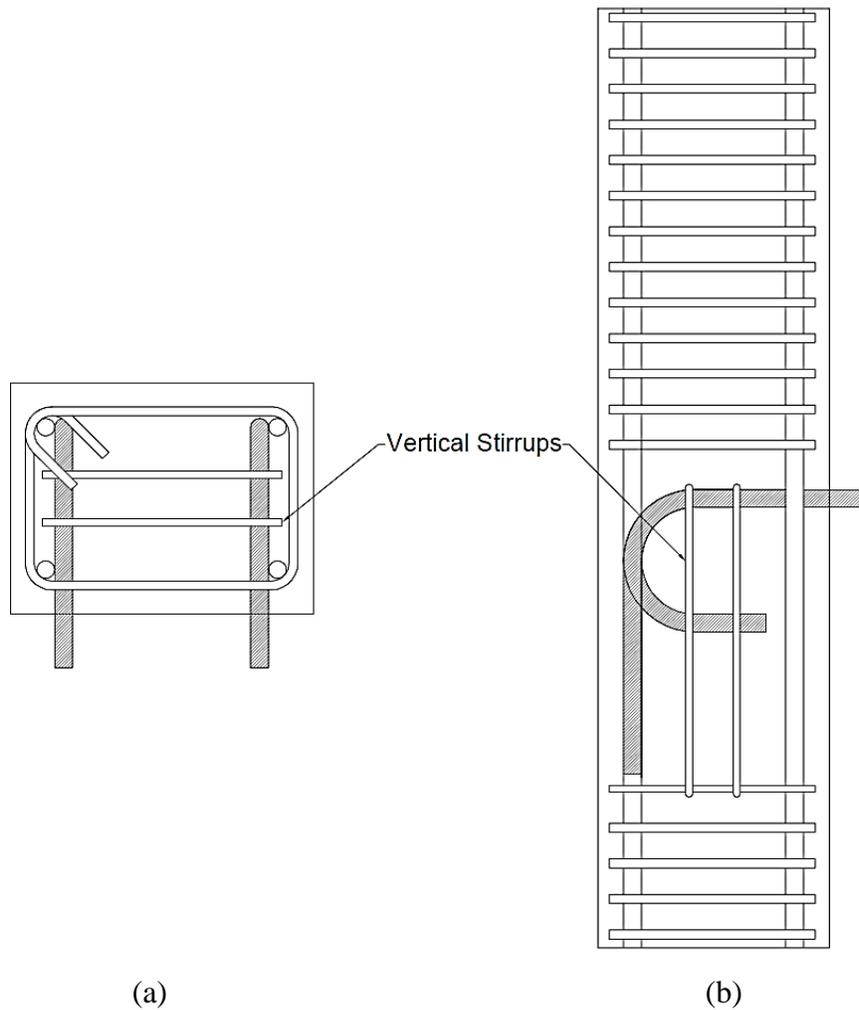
Details of specimen with vertical stirrups (a) cross-section and (b) side view
